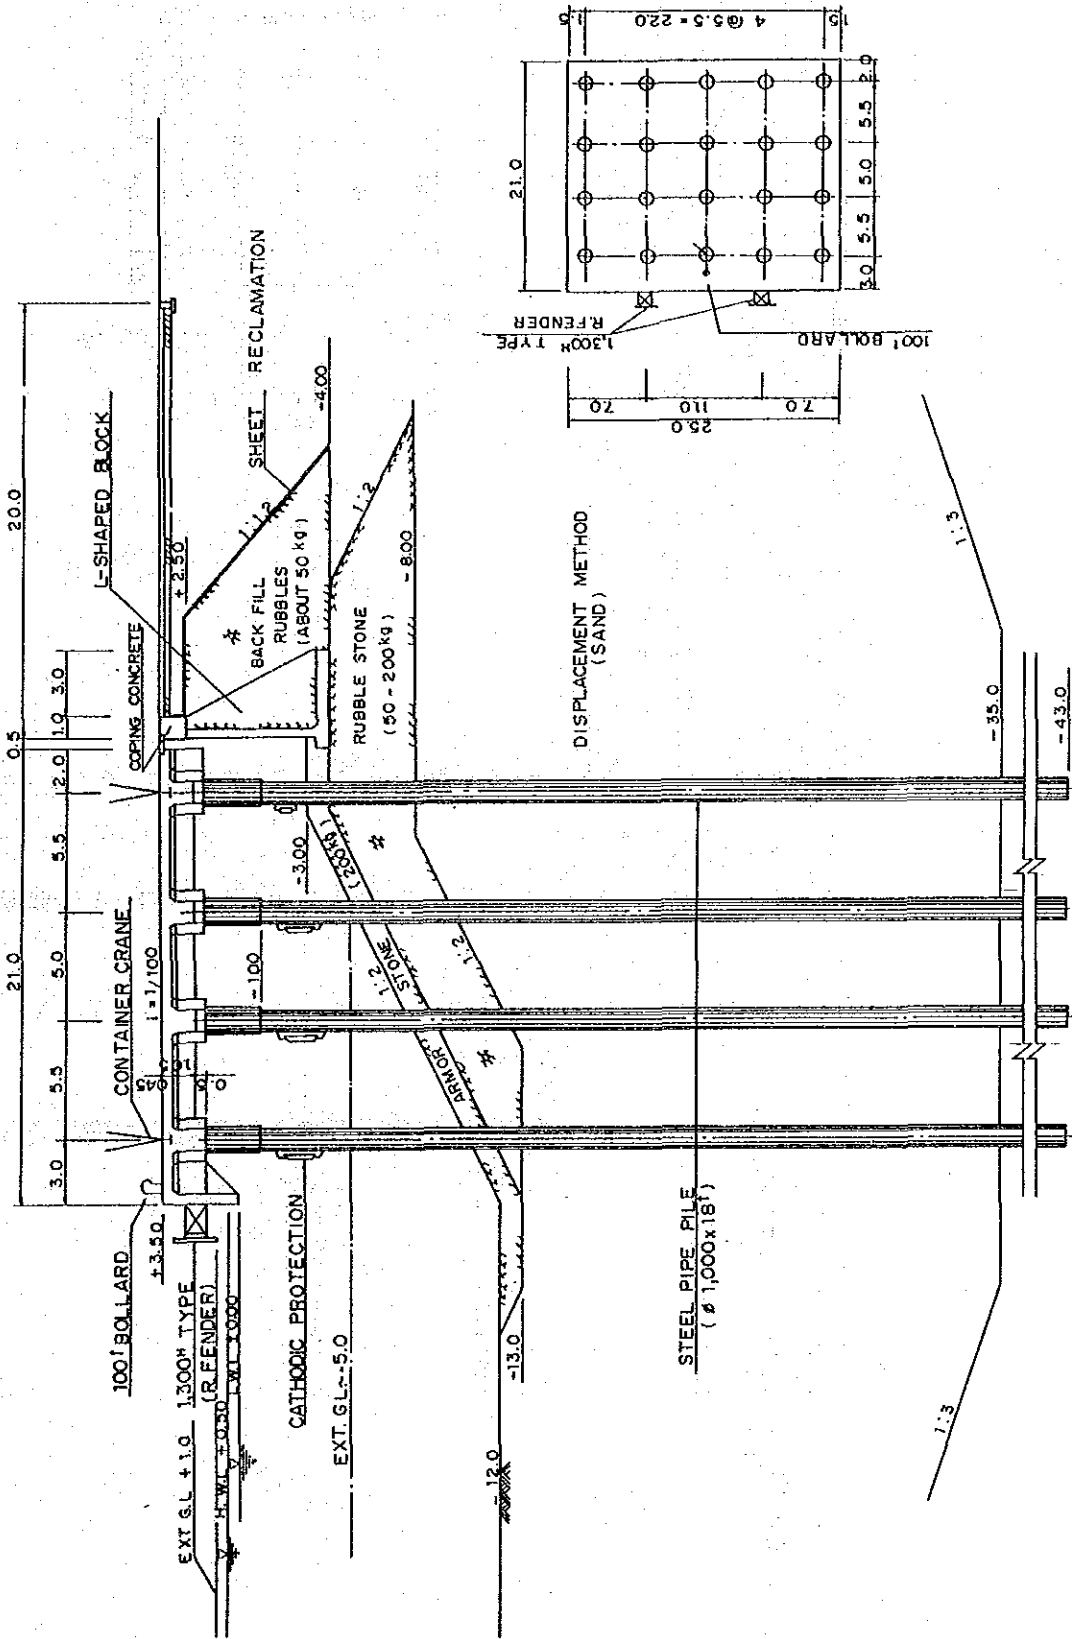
(A-i) ②-2 CONTAINER BERTH (-12.0) (PLAN A) (Unit; m)
